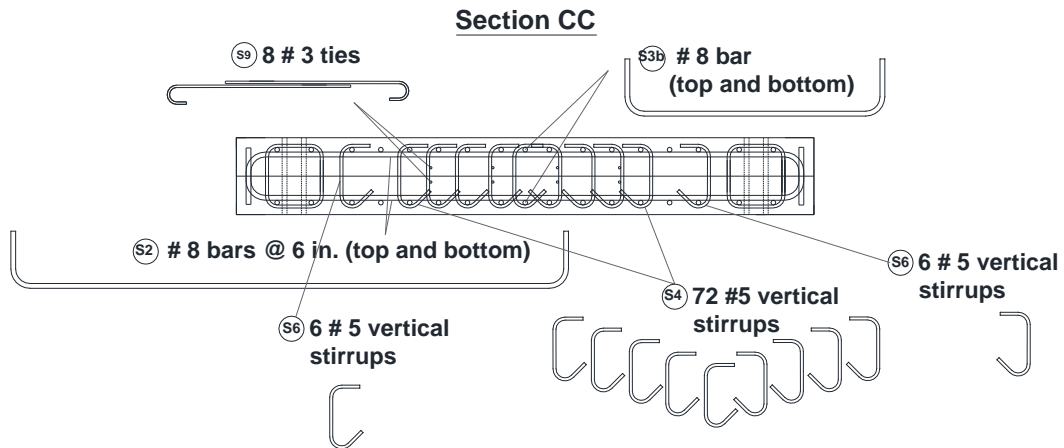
Elevation view of slab reinforcement at Section CC for Specimen #2
